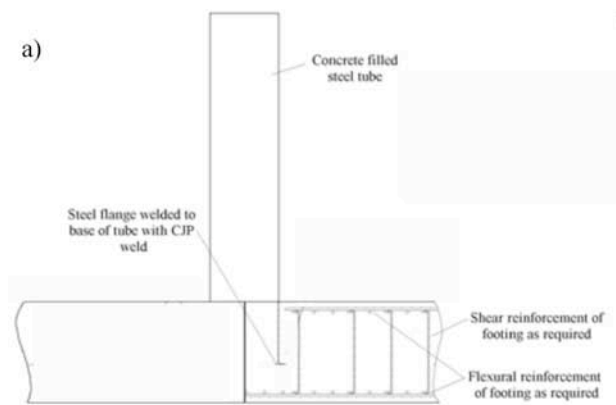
Proposed monolithic CFT pier or column foundation connections
